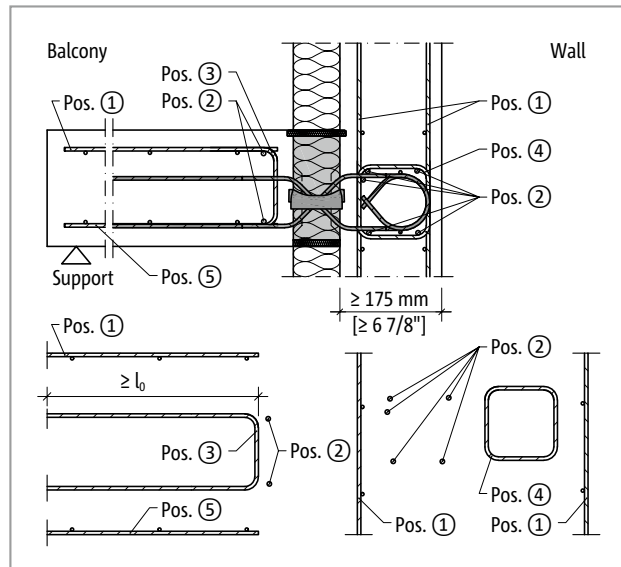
Schöck Isokorb® T Type CQ-VV1 to CQ-VV5: On-site reinforcement in wall
